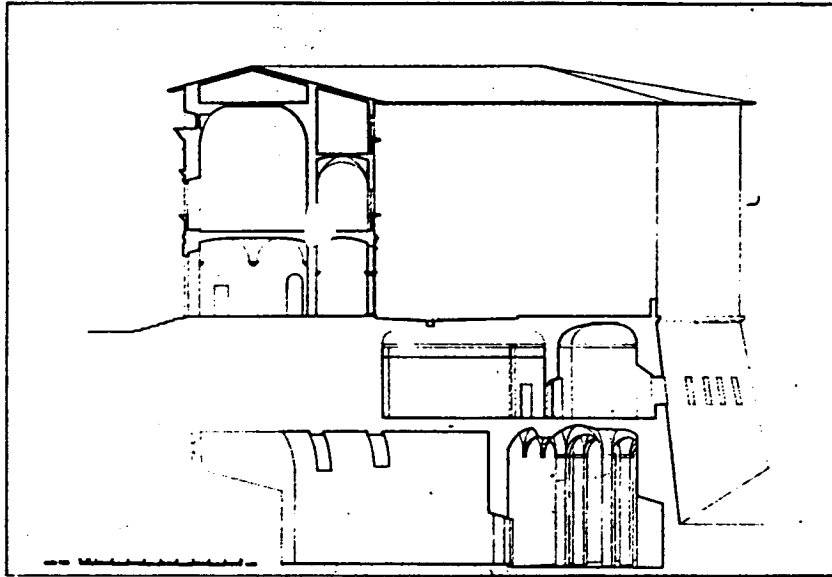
Palazzo Ricci: longitudinal section and plan of cellars (from Morganti)
